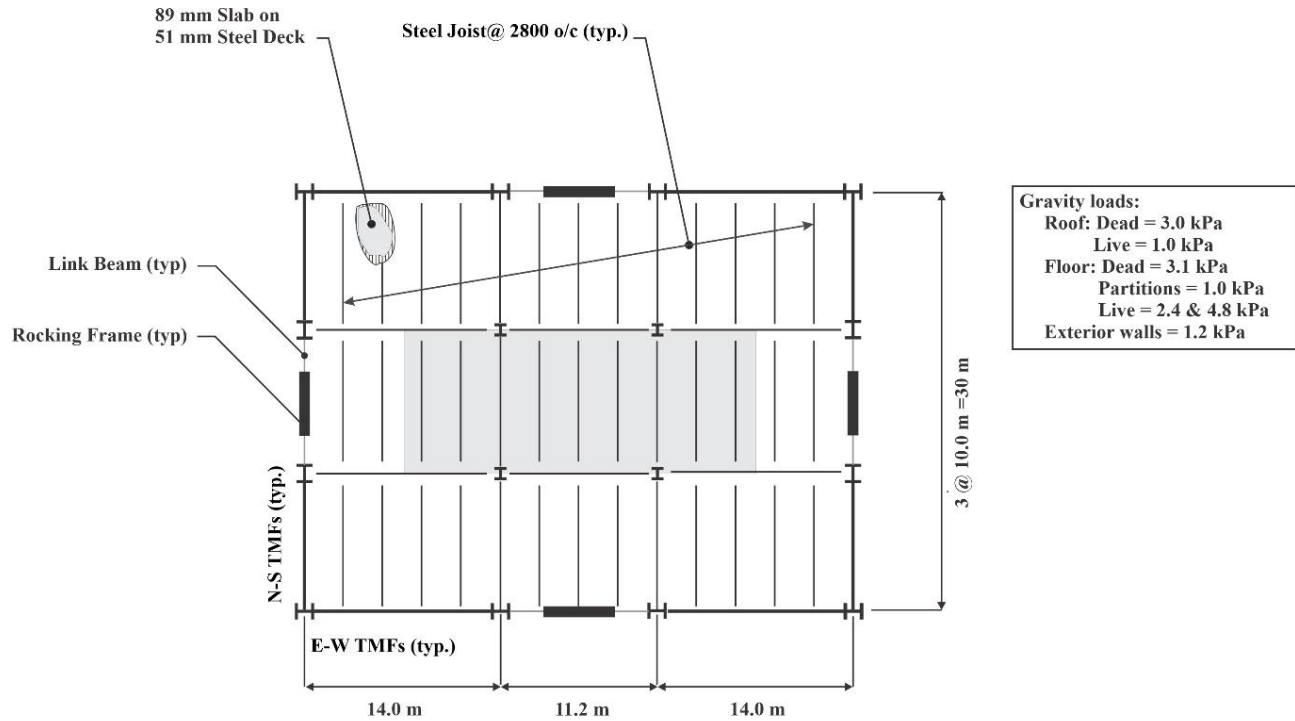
The plan view of the 7-, 9- and 12-story archetypal buildings
